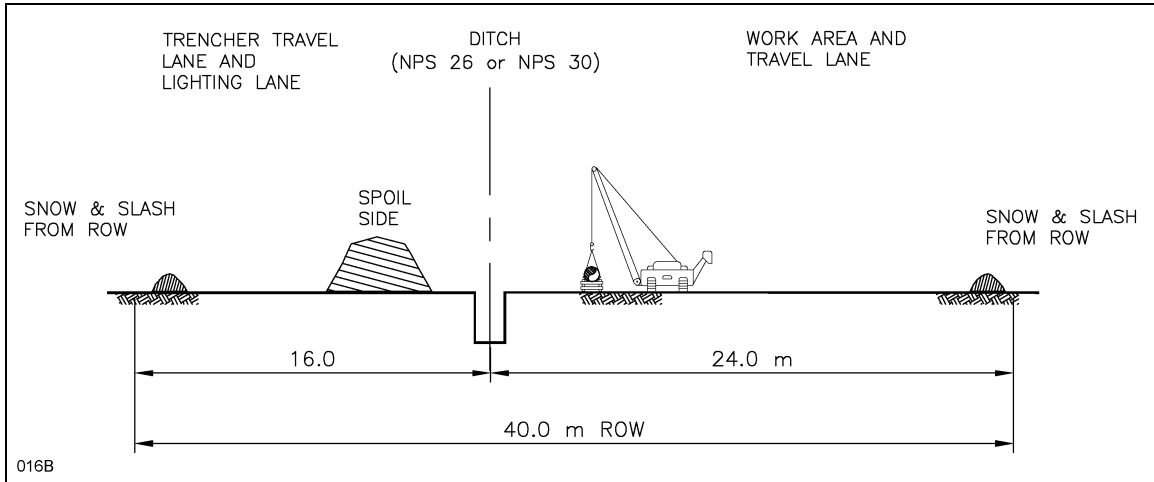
Typical Right-of-Way Configuration for Single Pipe (40 m)
